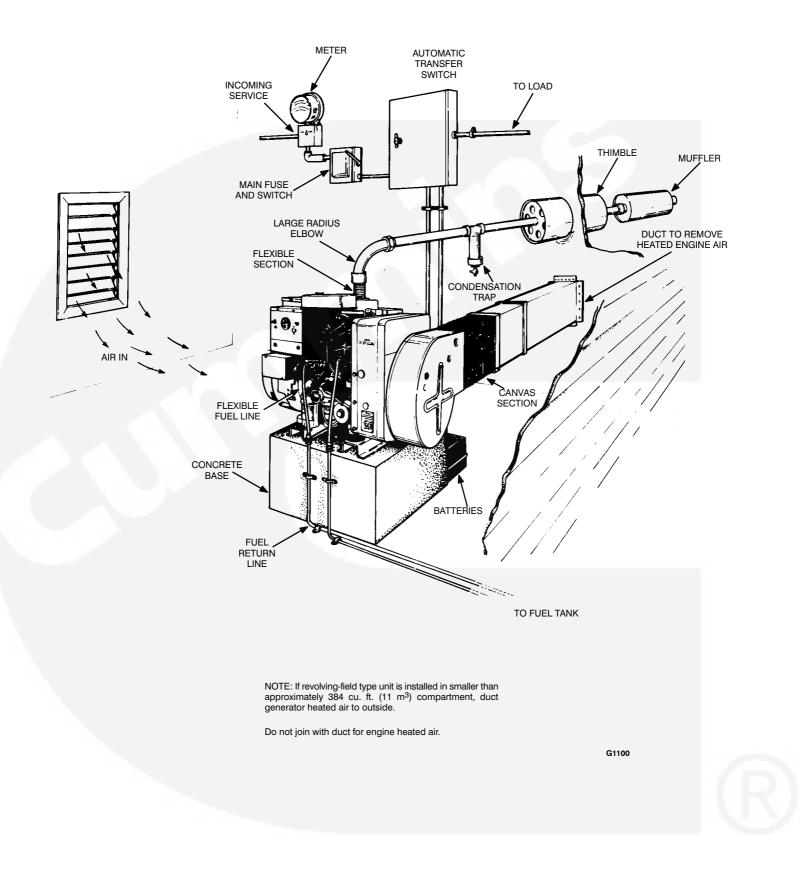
DJB, TYPICAL INSTALLATION
